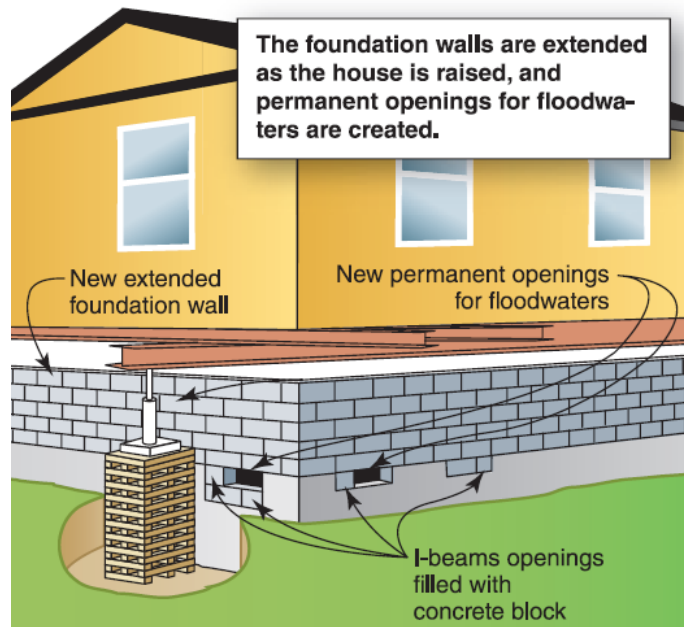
Foundation wall is extended to reconnection with the first floor of the home (FEMA).
